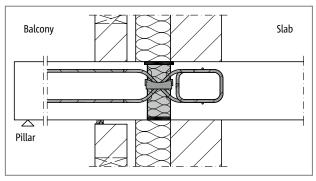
Schöck Isokorb® T type Q-E-W-VV: Connection for core insulation
